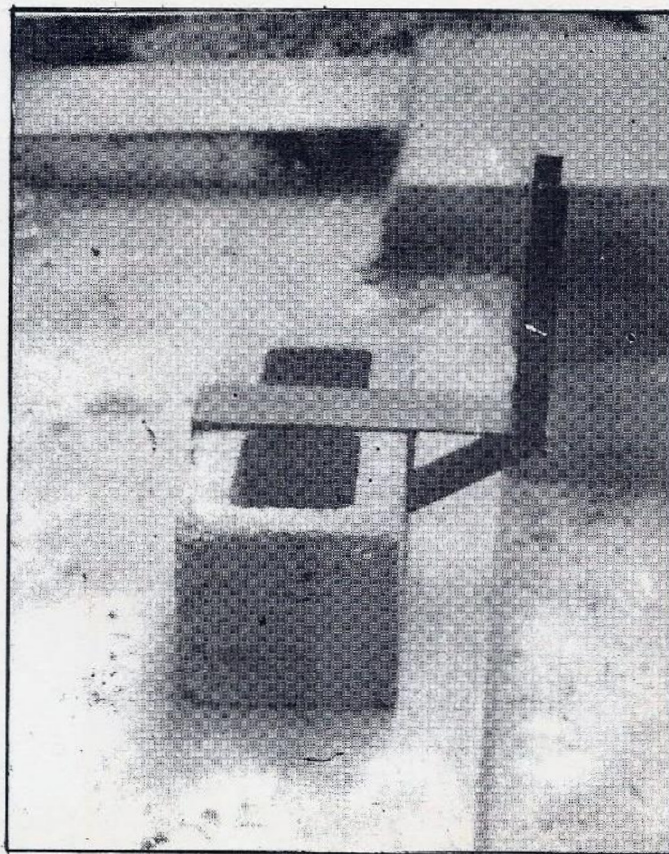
, WALL BRACKET FOR SLAB SHUTTERING
